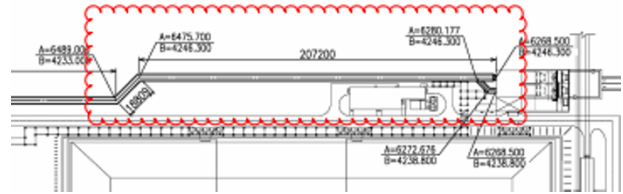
Location of jet grouting at Duyen Hai 3 thermal power plant
